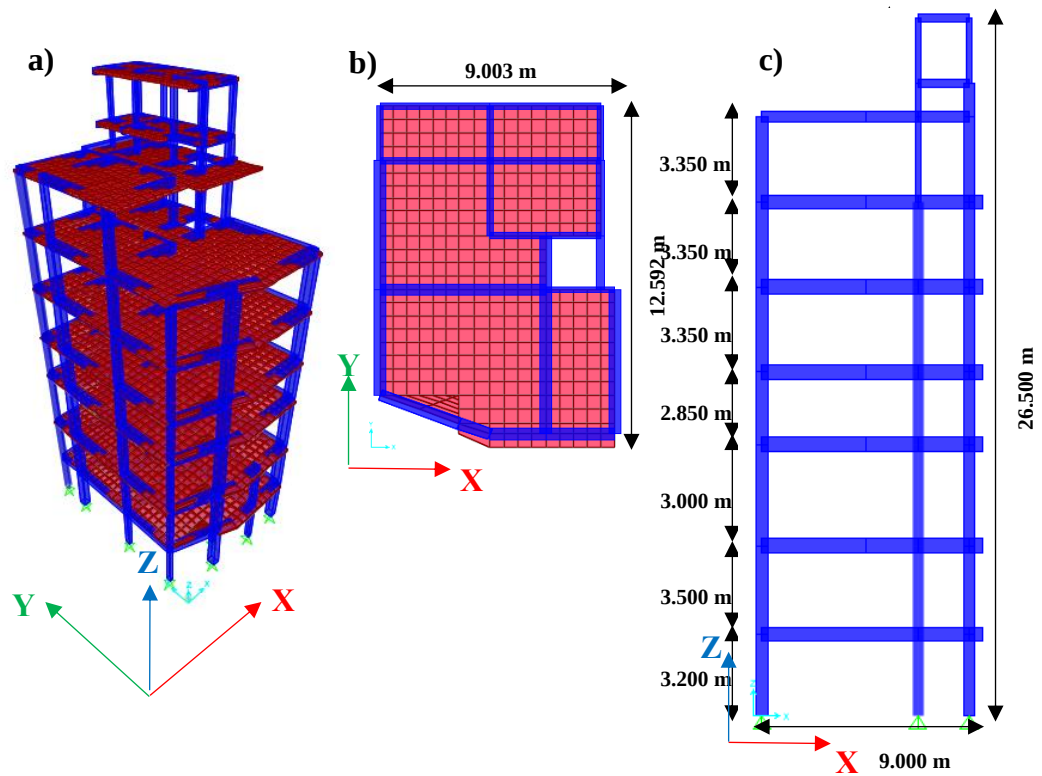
Finite element model of the retrofitted building in SAP2000 software (a) 3D view, (b) plan view, (c) a sectional view
